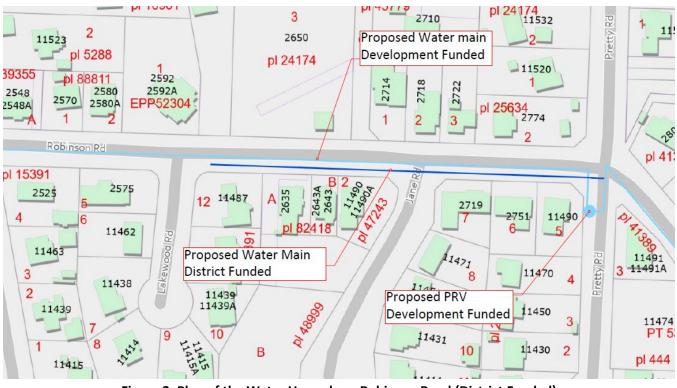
Plan of the Water Upgrades – Robinson Road (District Funded)
